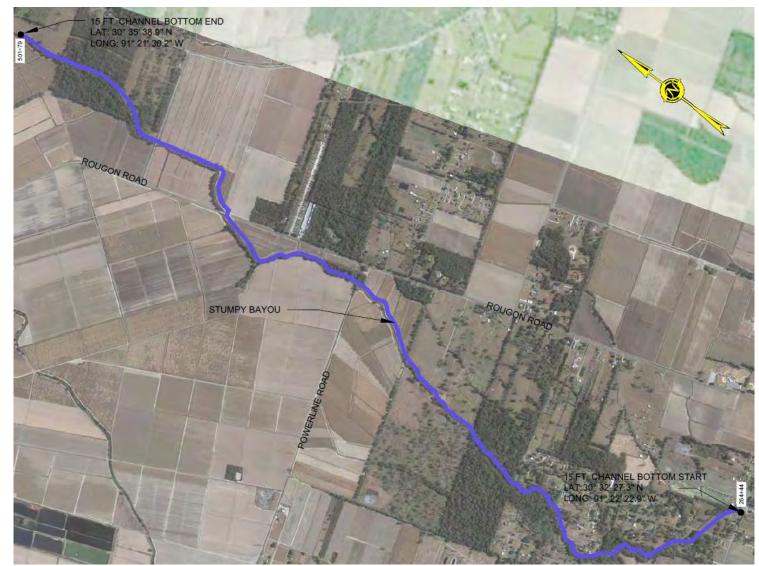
Plan View for the proposed 15 ft. channel bottom width segment of Bayou Stumpy for approximately 4.5 miles for the Bayou Stumpy Watershed Drainage Improvements Project provided by GIS Engineering, LLC.
